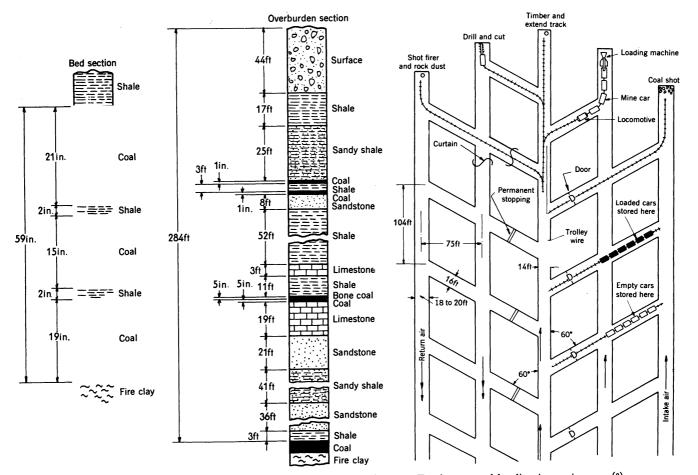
Geologic section and method of development at Mine 9 - Track-mounted loading into mine cars.⁽²⁾
